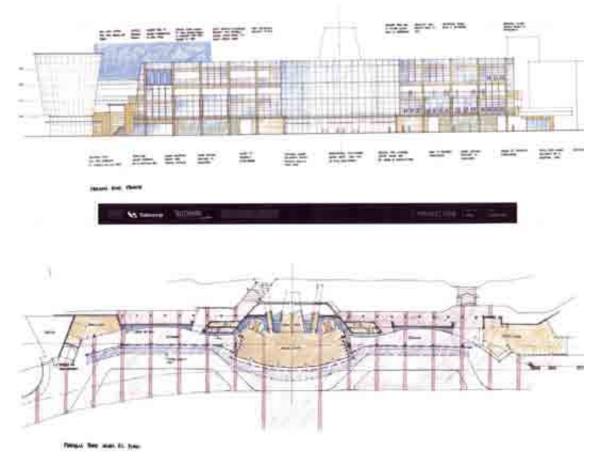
STAR project proposed new façade and canopy glazing facing Pirrama Road
